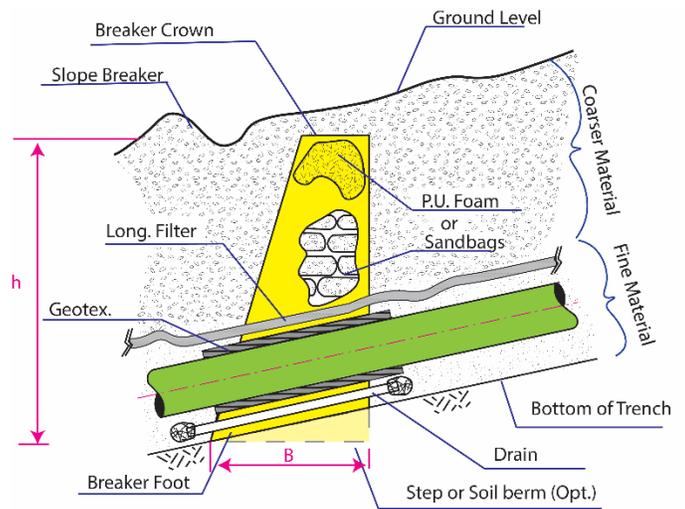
TYPICAL TRENCH BREAKER CONFIGURATION – LATERAL VIEW. FOR HIGH INCLINATION, THE BOTTOM OF THE TRENCH IS LEVEL, FORMING A SOIL BERM (DOT LINE).
